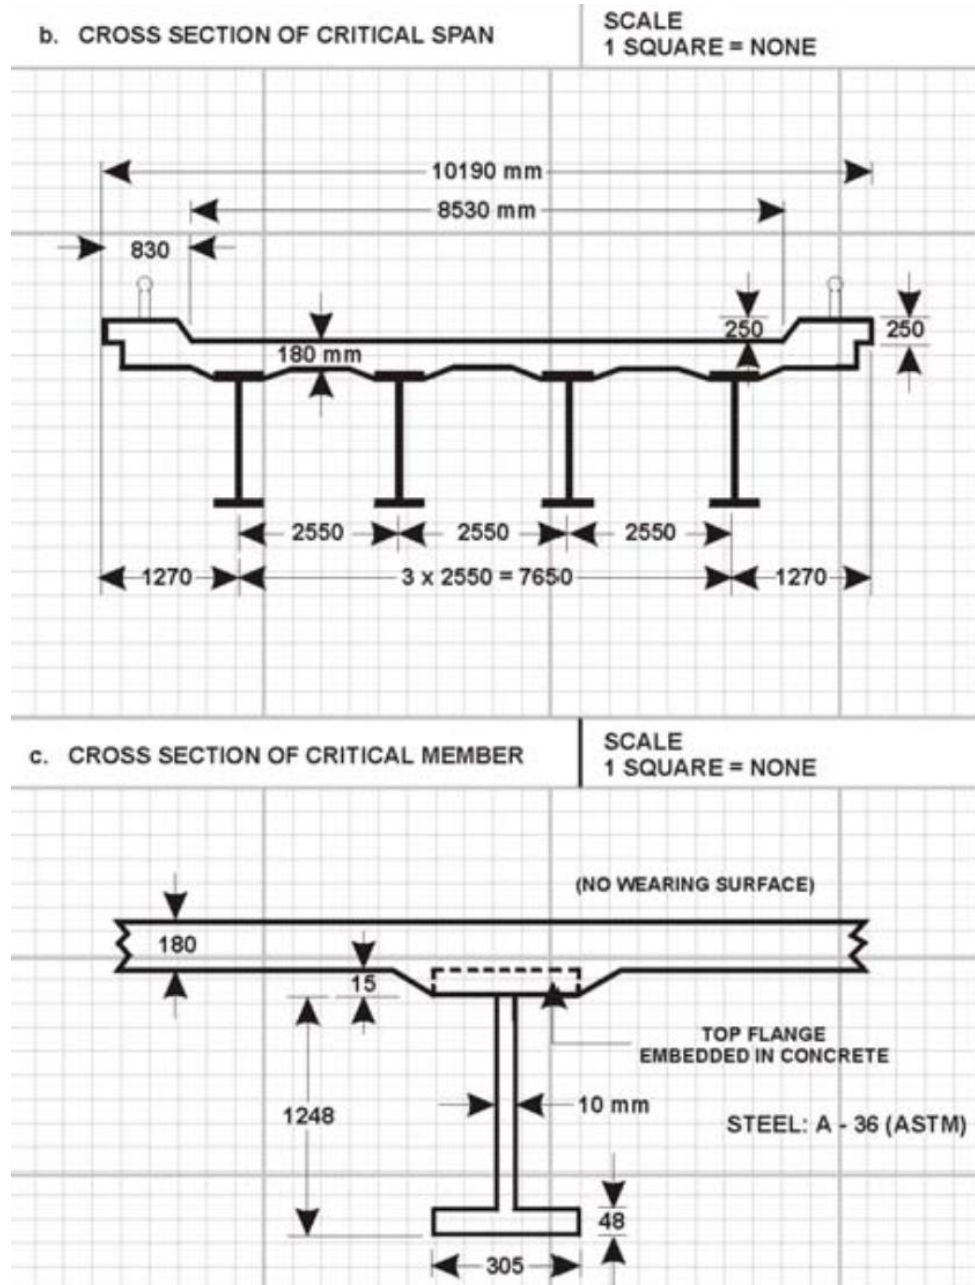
Cross section of bridge (DND, 2007a), 24.38 m steel-composite (x4)
